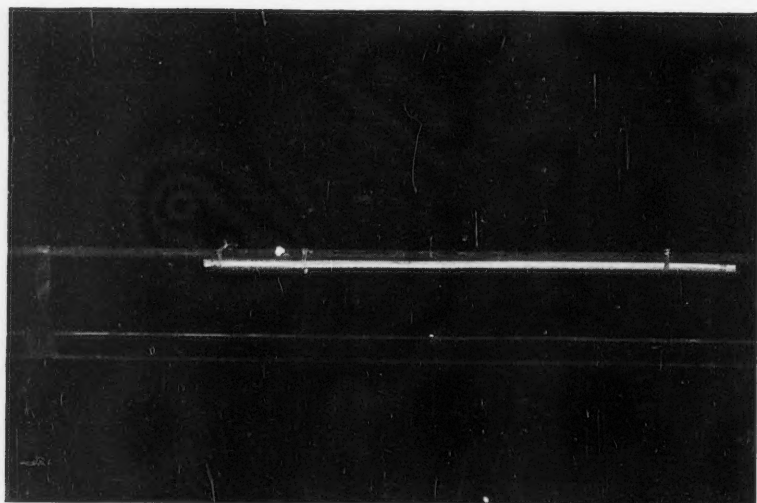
Strand samples installed in Hemphill tunnel, Norfolk and Western Railway, AAR tests.
